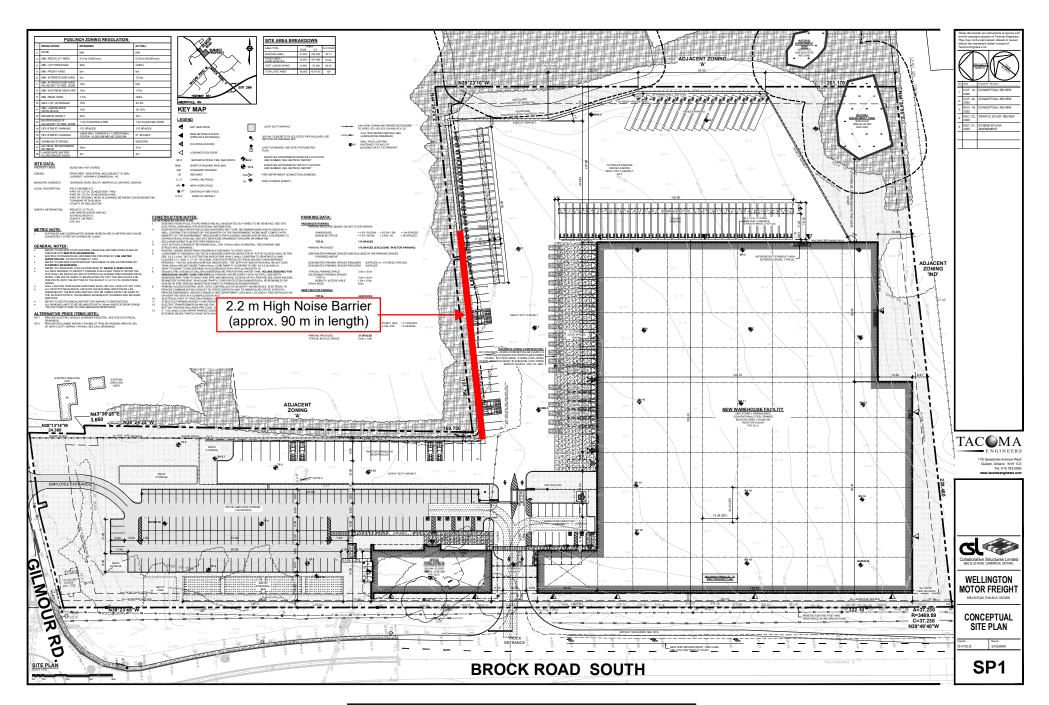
Proposed Site Plan Showing Noise Barrier Location
